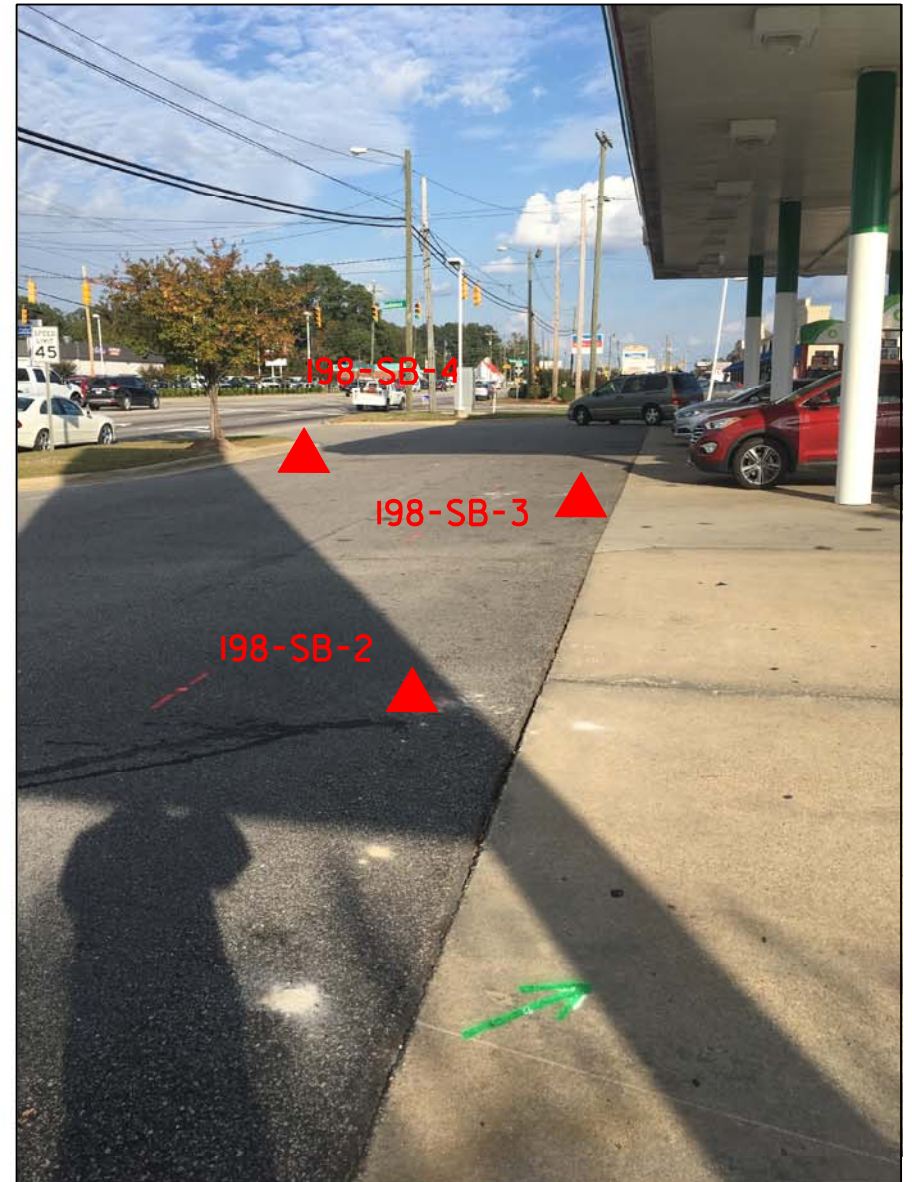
VIEW OF SOIL BORING LOOKING EAST
